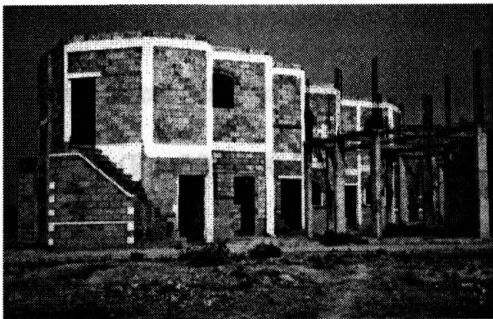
View showing the exposed structural framework and the use of hollow concrete masonry with stone aggregate finish.
